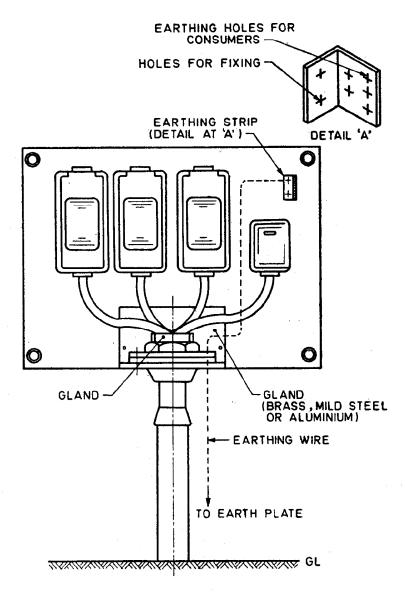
Typical Arrangement for Termination for 4 Core PVC Service Cable
